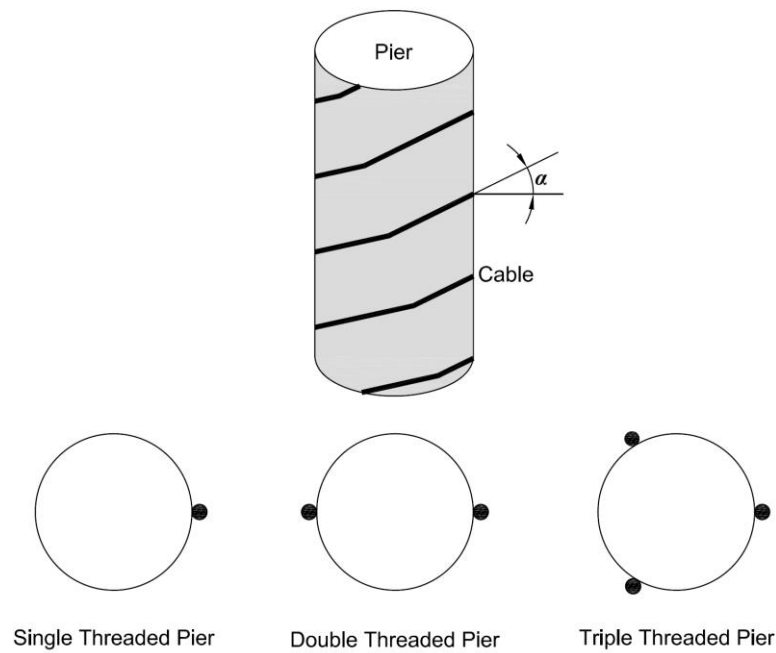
Threaded pier - helical wires or cables wrapped spirally on the pile to form thread (modified from Dey et al., 2006)
